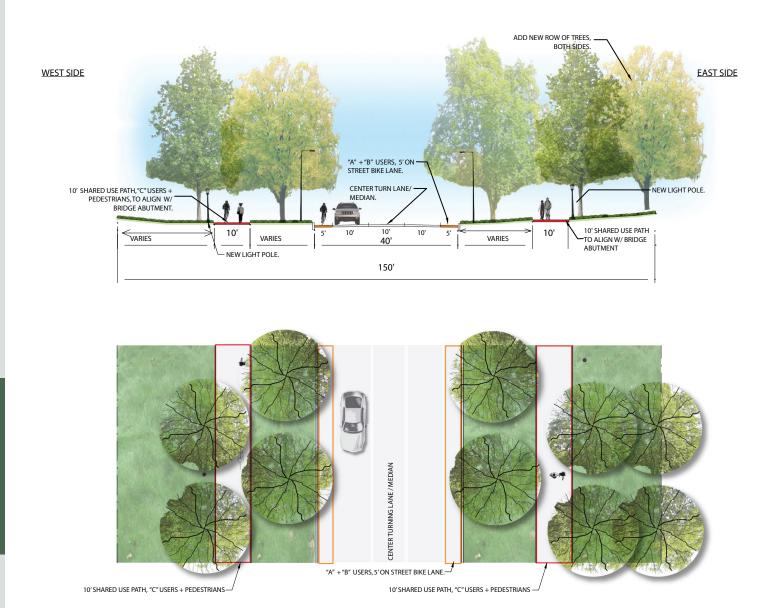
Southern Parkway: Zone 2 Prototypical Section & Plan
